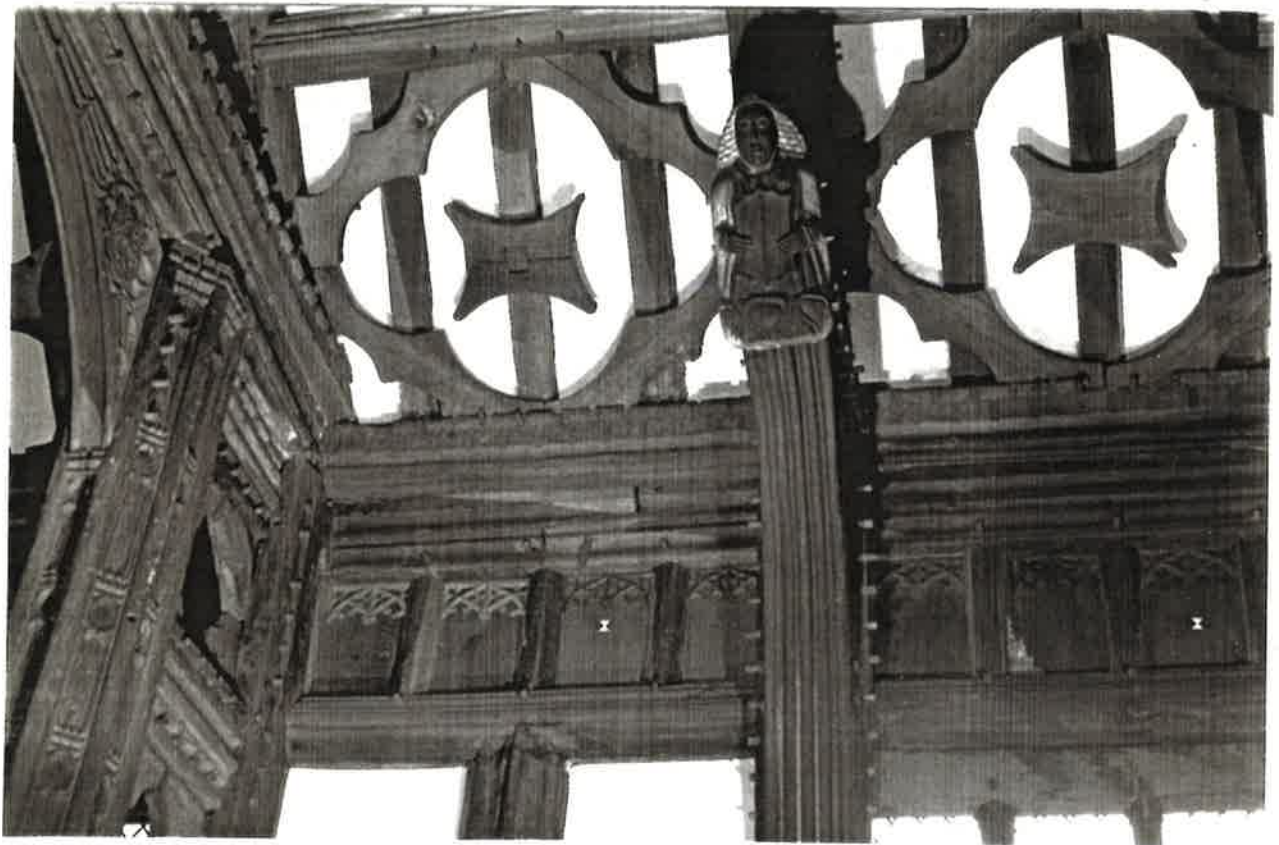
Internal view of roof, showing hammer-beam with angel terminal
